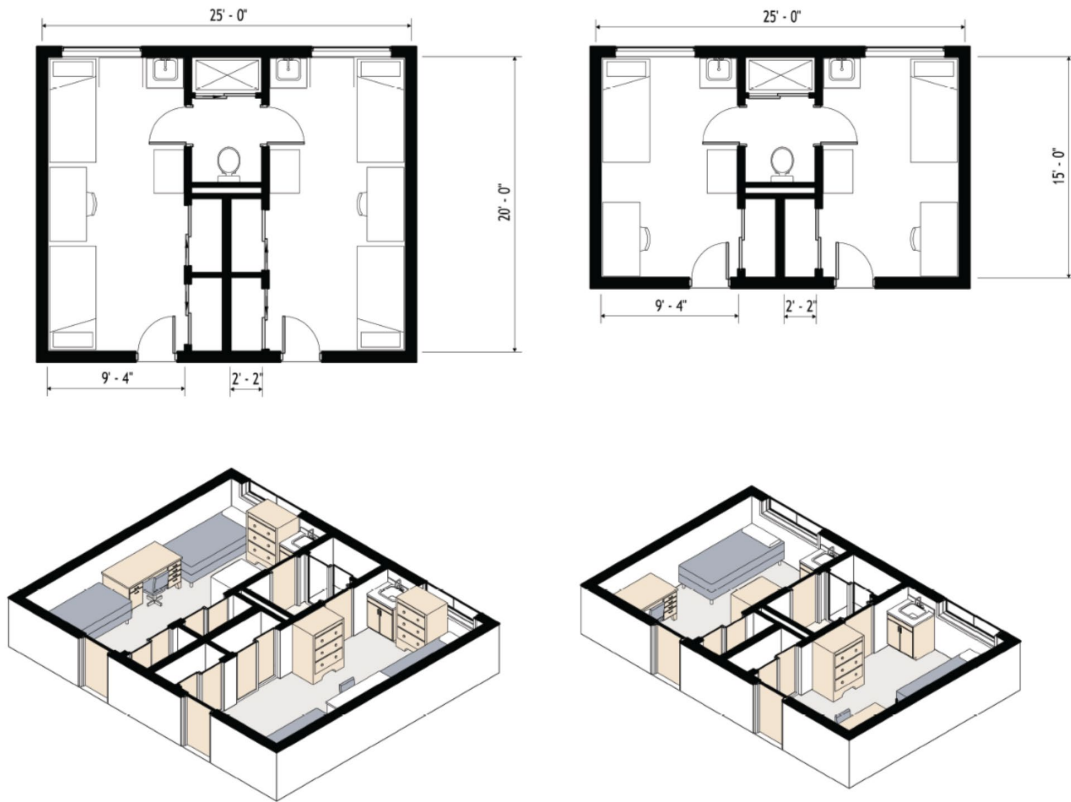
Author's Dormitory Plans (Based on CSULB Beachside Floor Plans)
